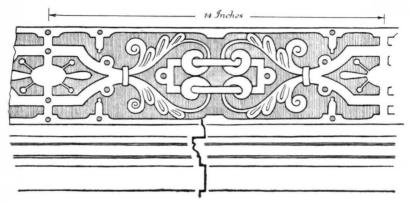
Plaster Frieze in Room on Second Floor of West Tower.
